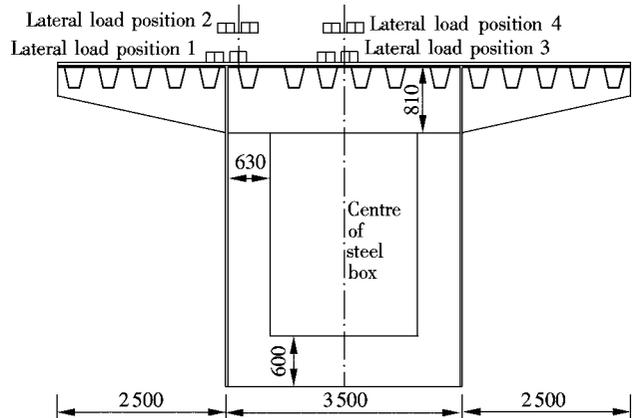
Half cross-section of girder and lateral load positions (unit: mm)
